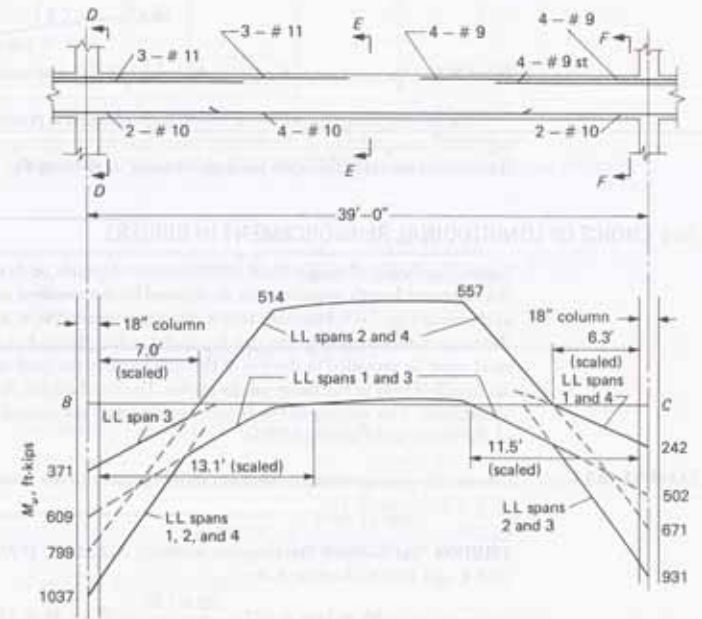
Moment envelope and longitudinal bar arrangement for girder 2G2 (span 2).
